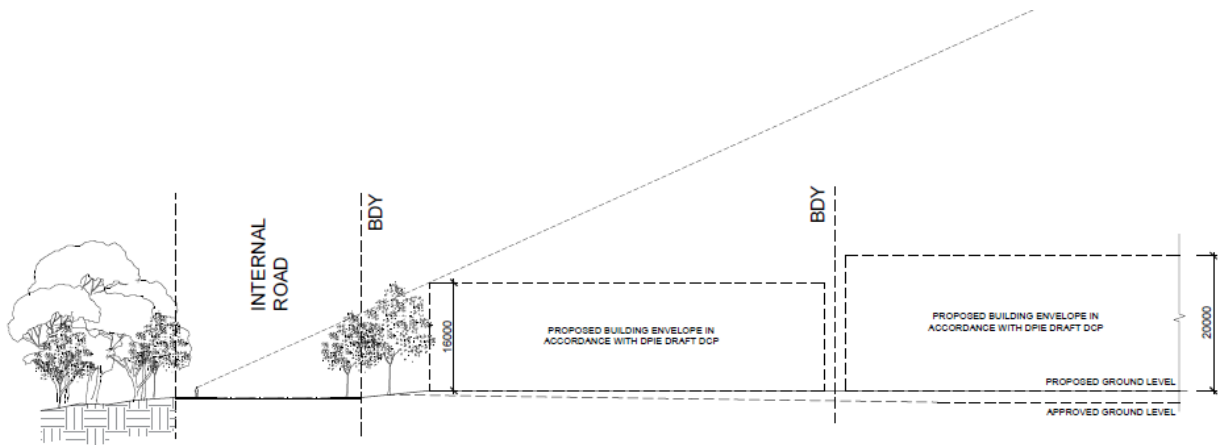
Section (Location 05) showing ground levels and viewlines in relation to riverfront land (Source: MCHP Architects)
